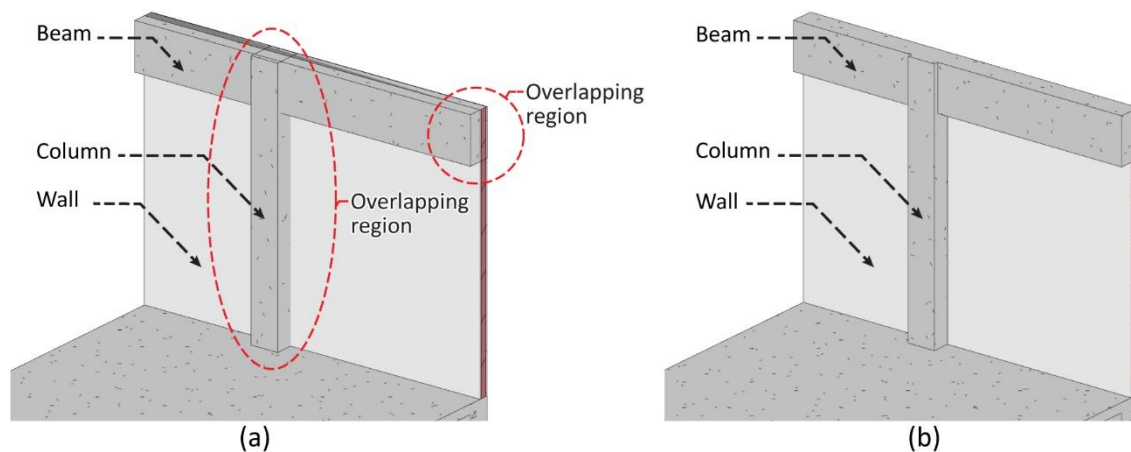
(a) The wall that overlaps with the column and beam causes excess wall material quantity. (b) The correct modeling method separates the wall from the structural elements.
